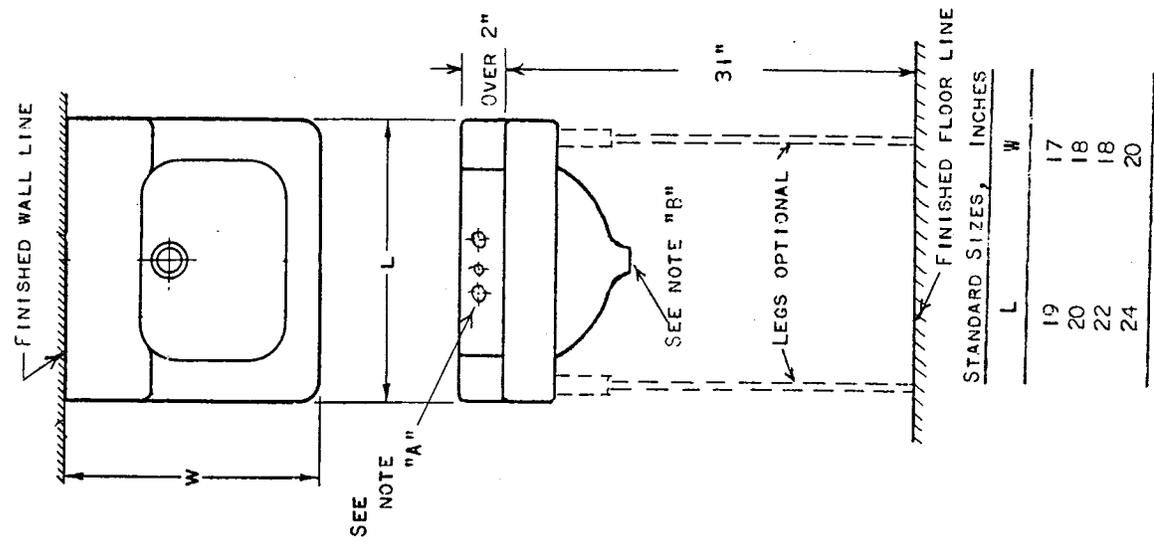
DETAIL "C" - LAVATORY OUTLET DIMENSIONS
